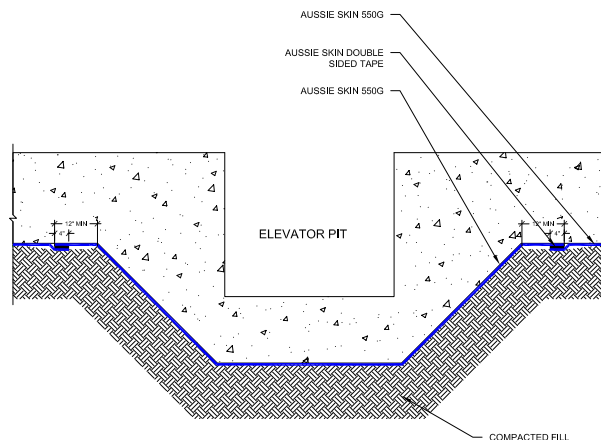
STANDARD ELEVATOR PIT DETAIL
